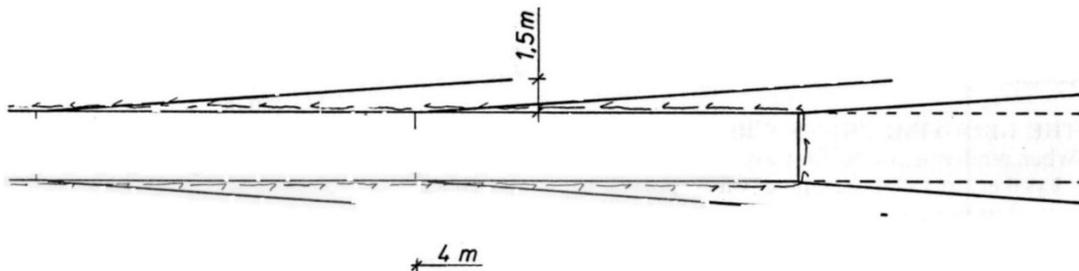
Drillholes for Pregrouting. TBM Tunnels.
